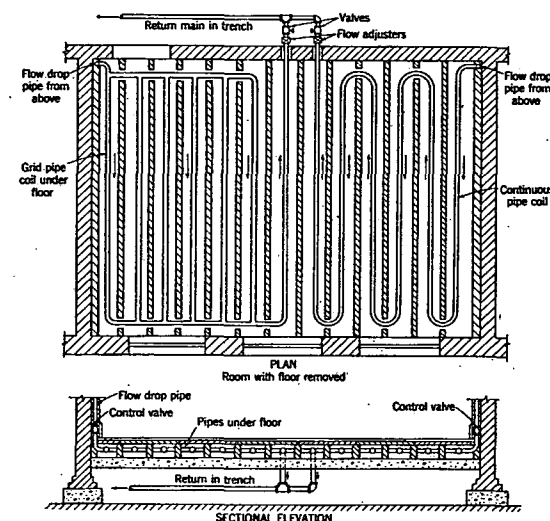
ARRANGEMENT OF CONTINUOUS PIPE COIL IN FLOOR CONSTRUCTION
